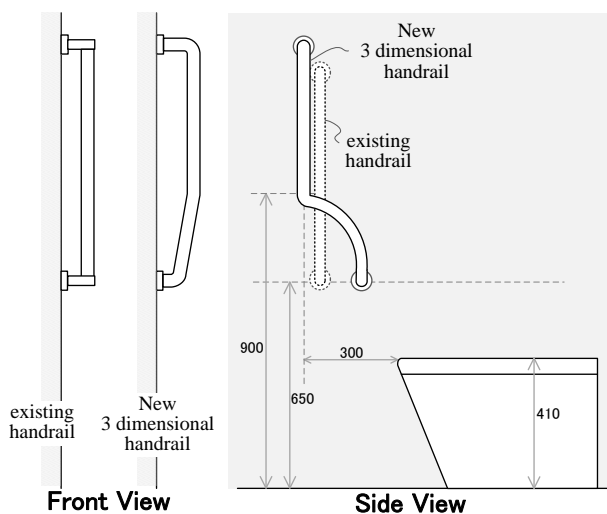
Front and side view of the handrails; existing handrail 'I-type' and proposal of a new 3 dimensional handrail.
